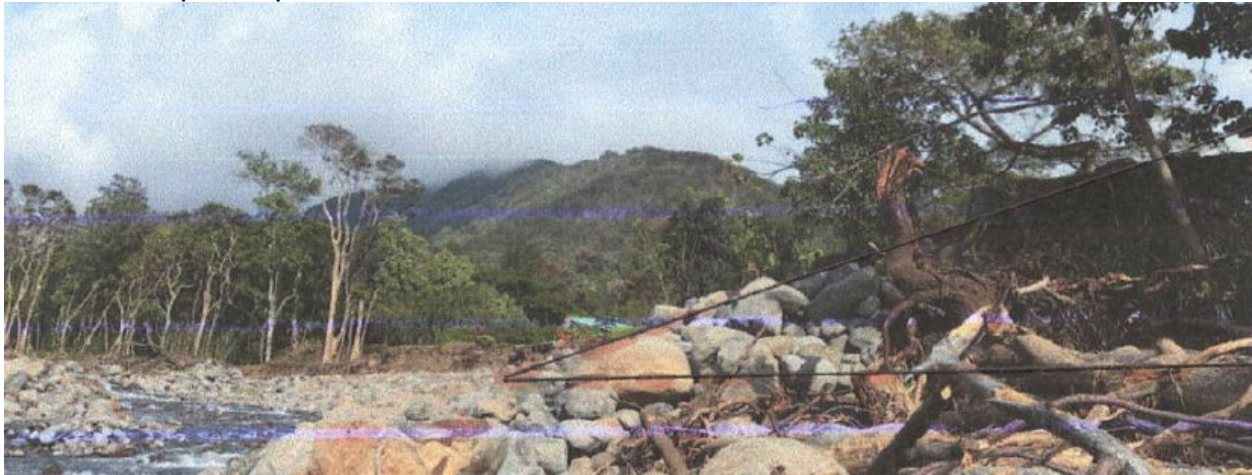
View from top of left streambank. A portion of the concrete stairs that washed away is visible in the bottom right of photo. Rocks were piled against the denuded left bank to reach the top of the remaining stairs.
